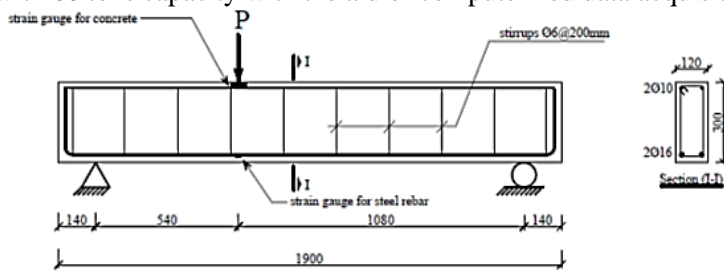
a. Details of reinforcement for tested beams (Dimensions in mm).
